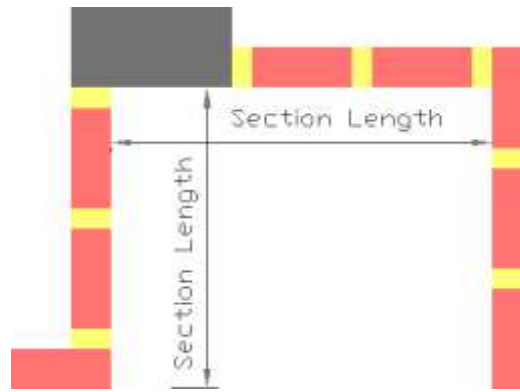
A corner column located on an inward corner effects the dimensioning of only one section
